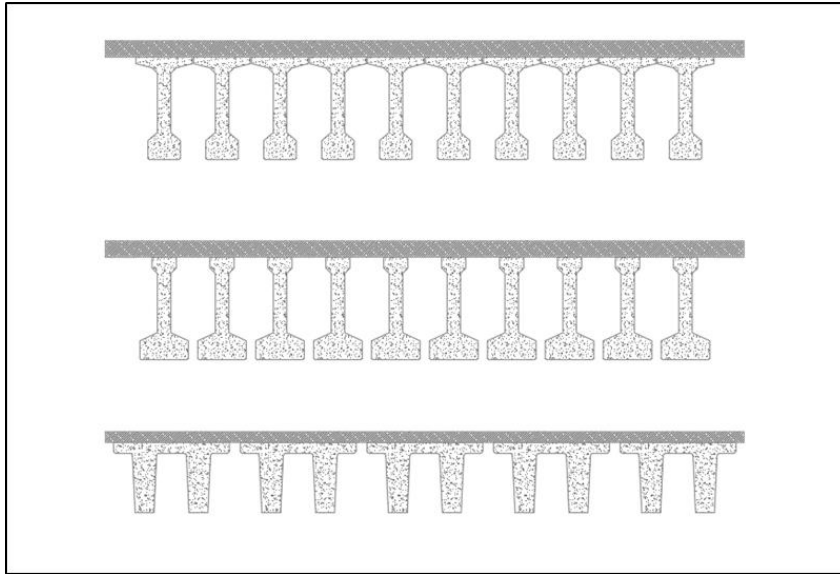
Ordinary High-speed Railway Deck, Precast Sections
